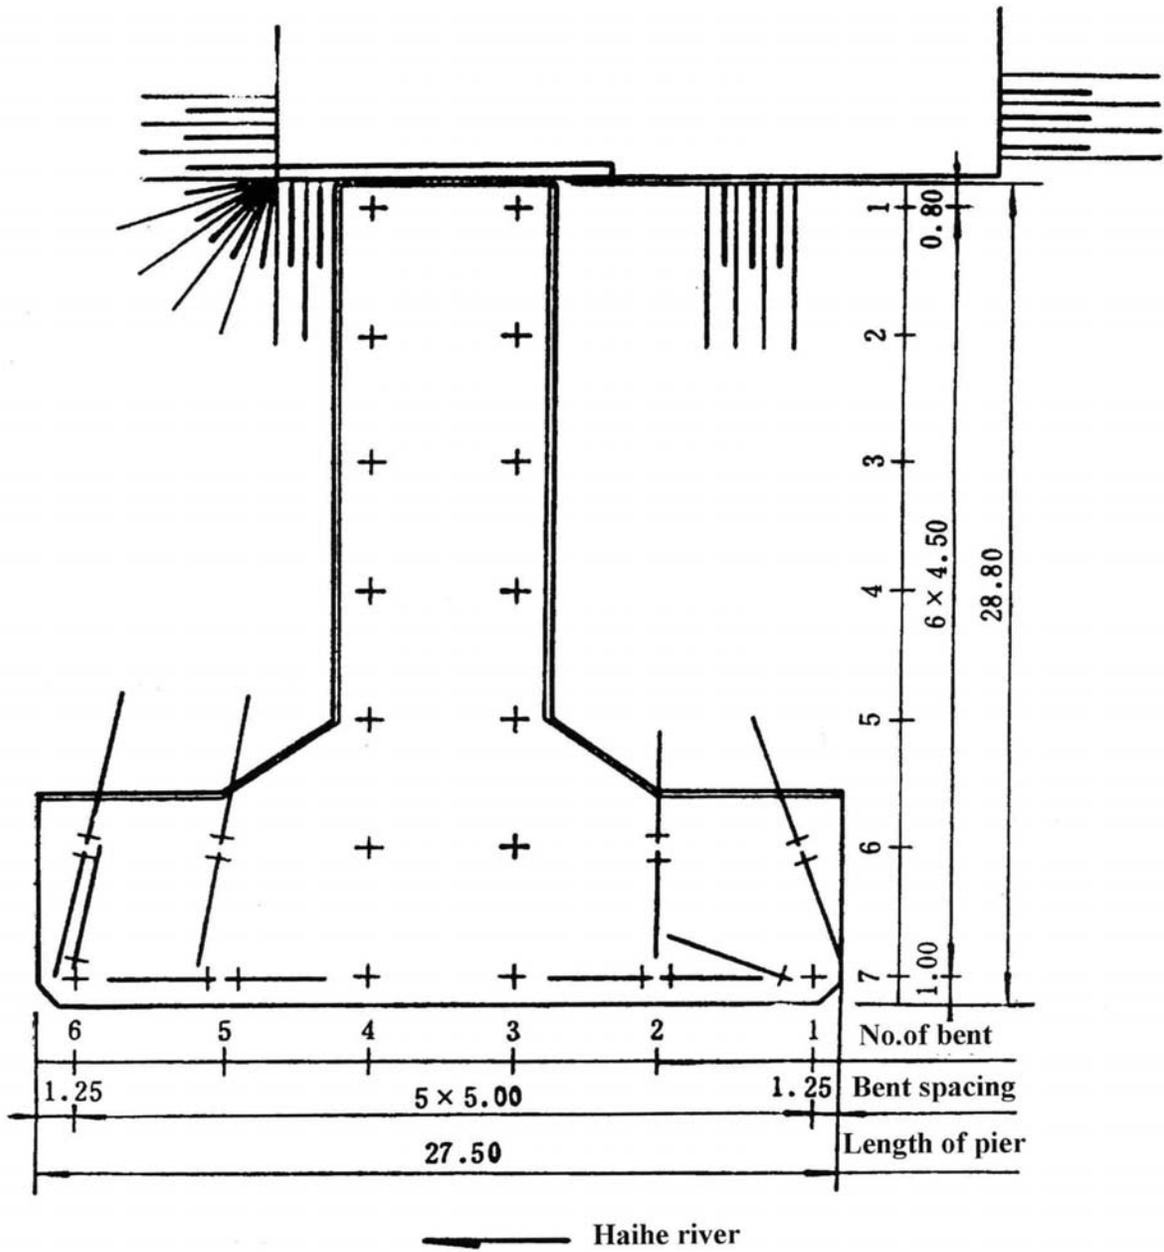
Plan of the pier for the Overhaul Works of TCEB and pile layout (in m).
